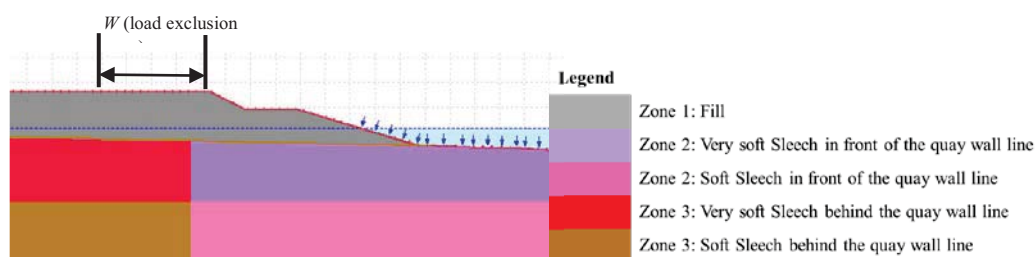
Cross section of the working platform and the underlying ground layers at the end of the construction
